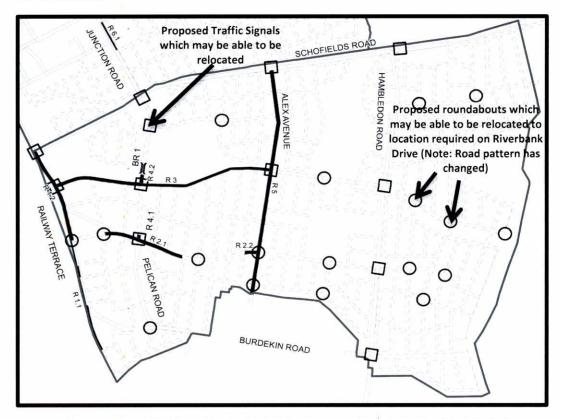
Contributions Plan Traffic Infrastructure location plan (BCC, 2013)
